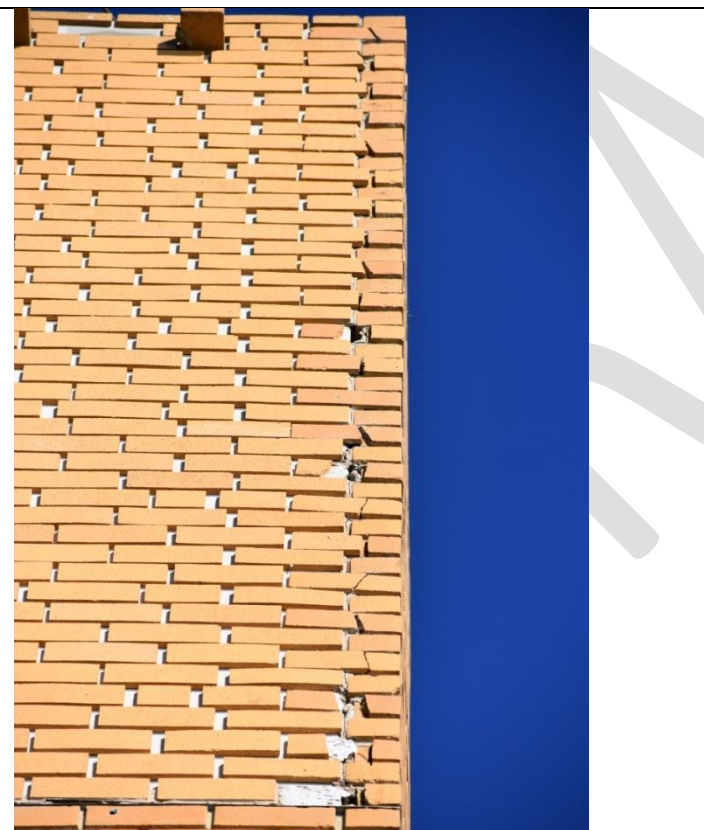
Vertical cracking at interface between brick masonry wall and FRP/fiberglass brick-veneer clad parapet at corner
